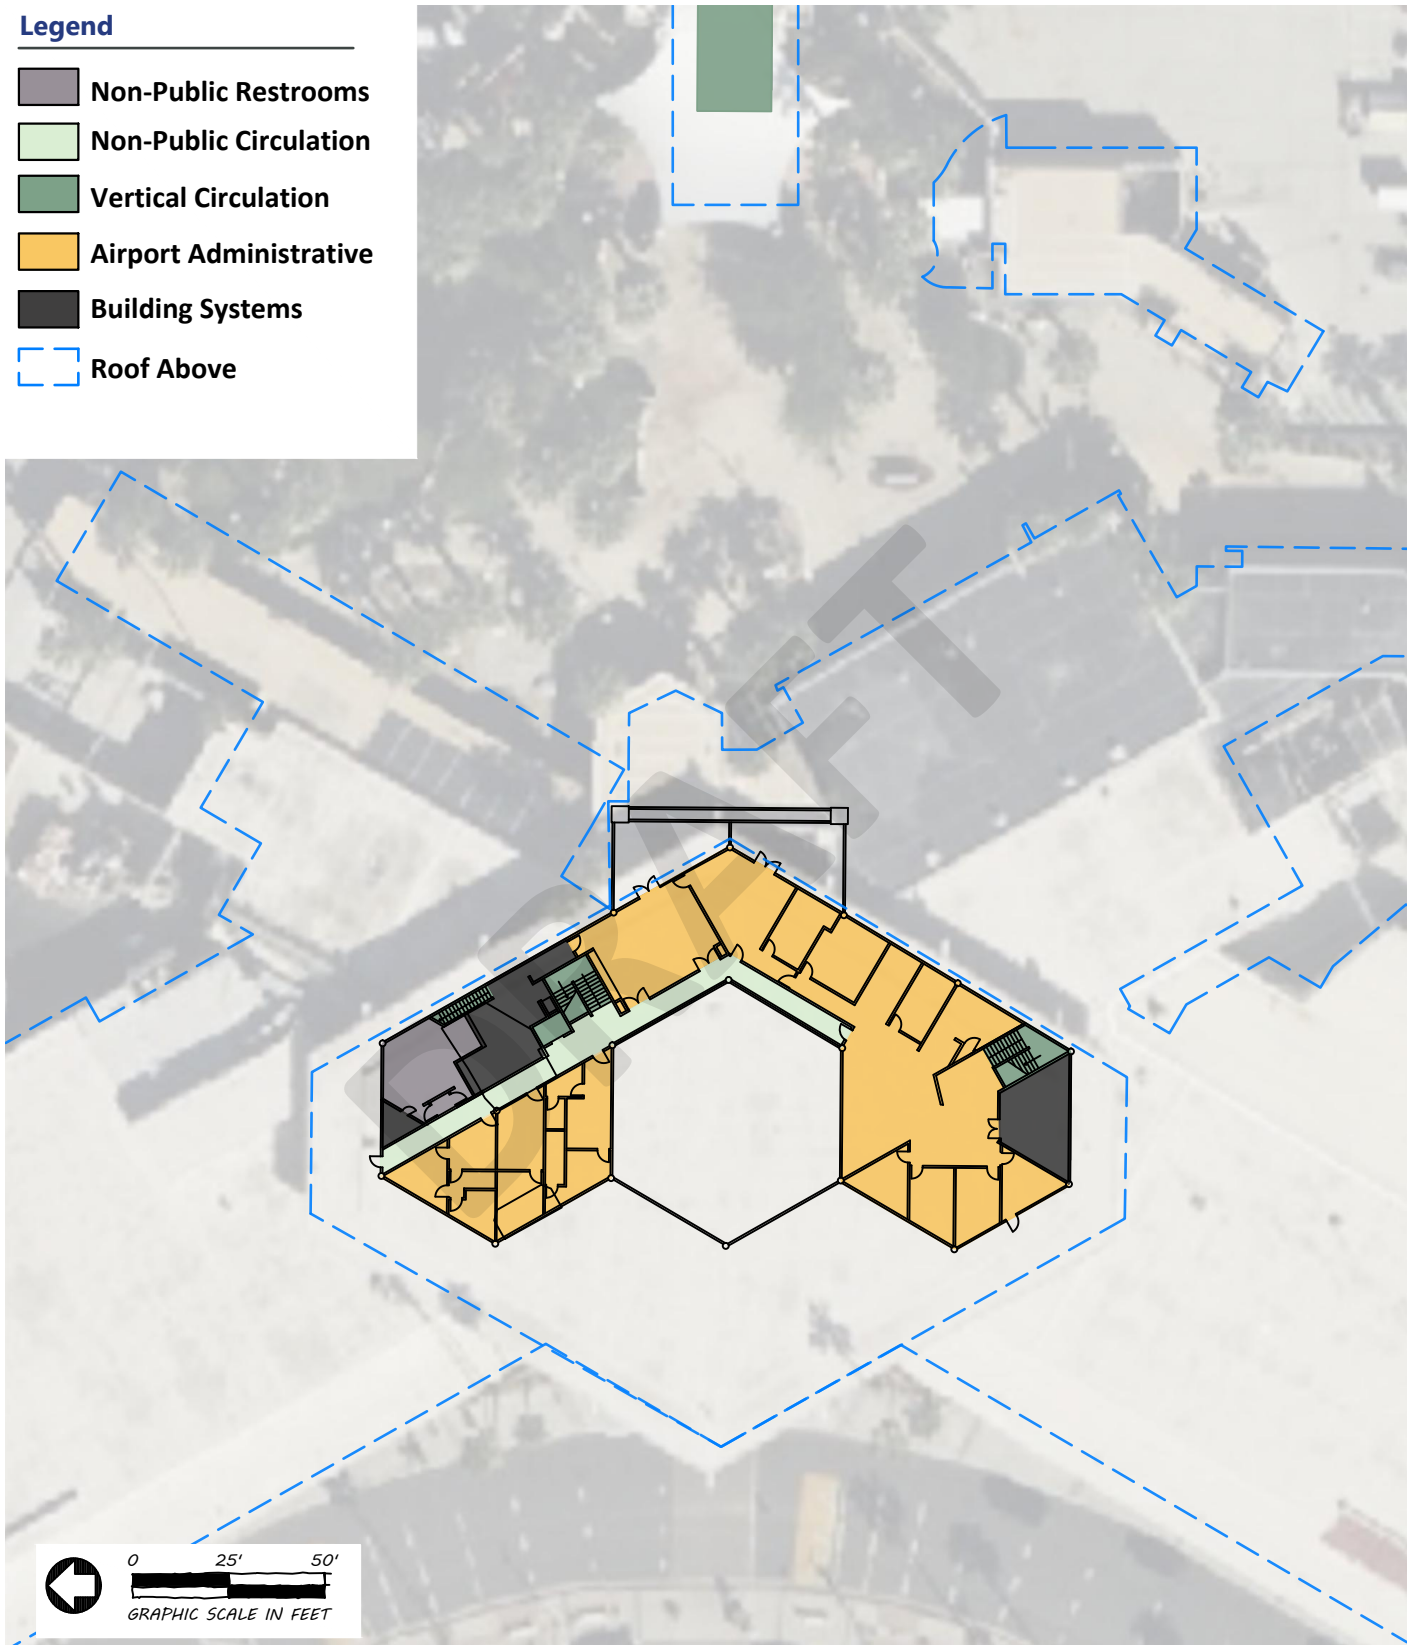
Terminal Floor Plan - Mezzanine Level
